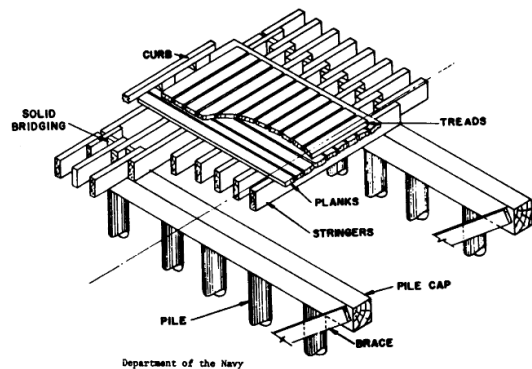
Timber deck structure. (Dept. of the Army USA1983: 8-19)
